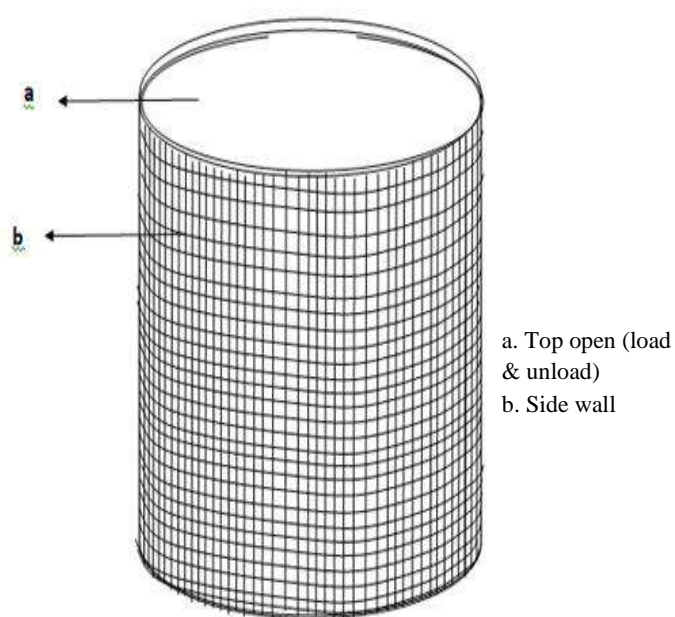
Schematic diagram of Panatha structure made of Cement and Brick provided with opening on top to load & small opening at bottom to draw seeds.
